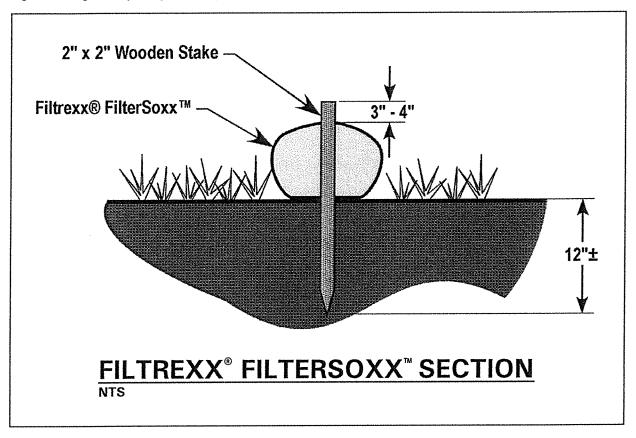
Engineering Design Drawing for Staking of Concrete Washout
